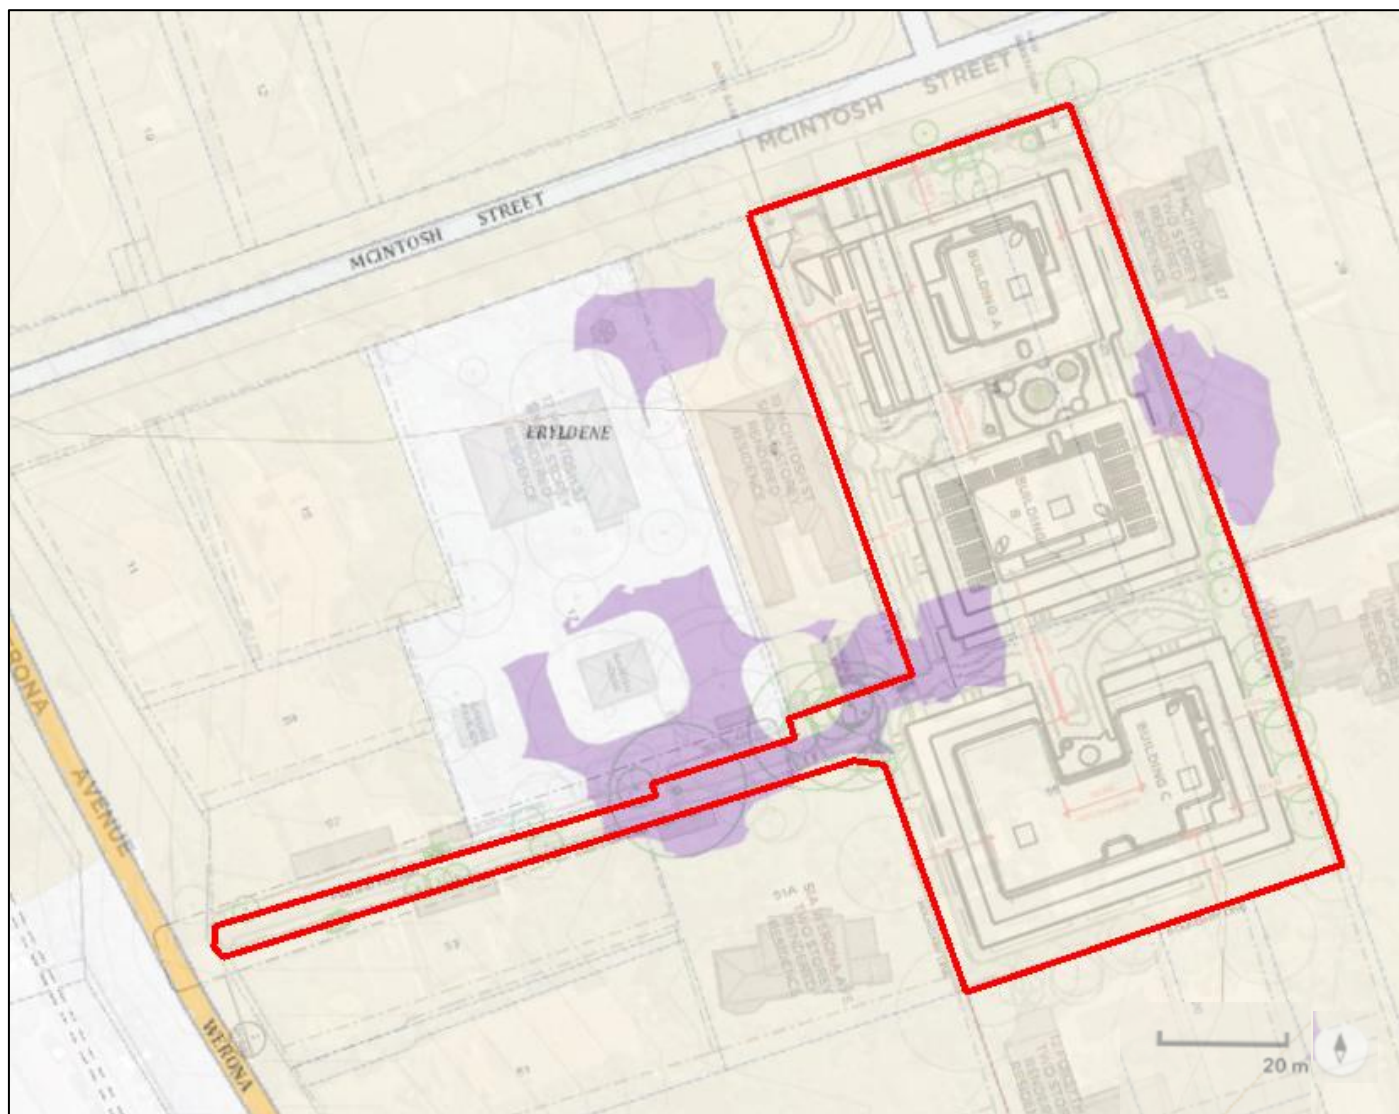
Site plan showing the extent of the footprint and retained trees. Source plan: PMDL, Revision D, dated 1st April 2026.
